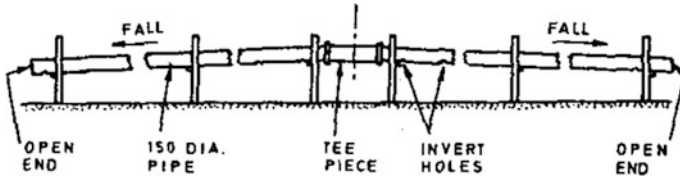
Typical spray-bar detail (Cambridge and Coulton 1990)
